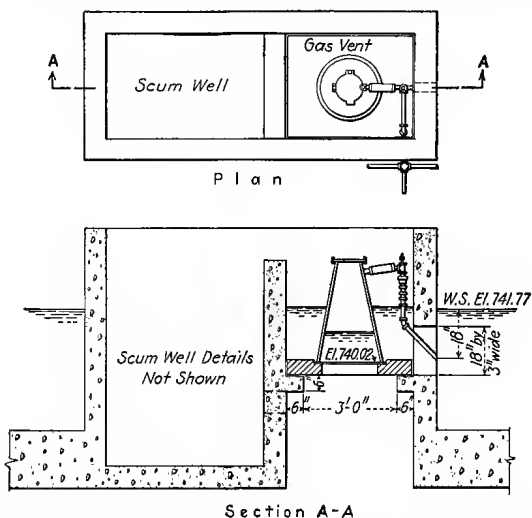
Gas-collecting dome in Imhoff tank at Dayton, Ohio.
